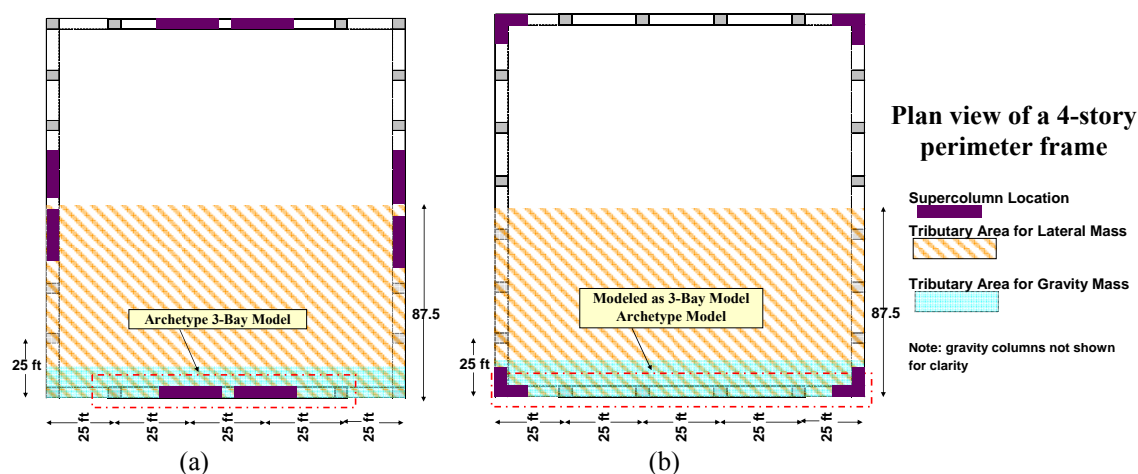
Possible configurations of ‘supercolumn shear wall’ retrofit, showing (a) construction of supercolumns around existing interior columns and (b) construction of supercolumns around existing exterior columns. Supercolumns not to scale.
